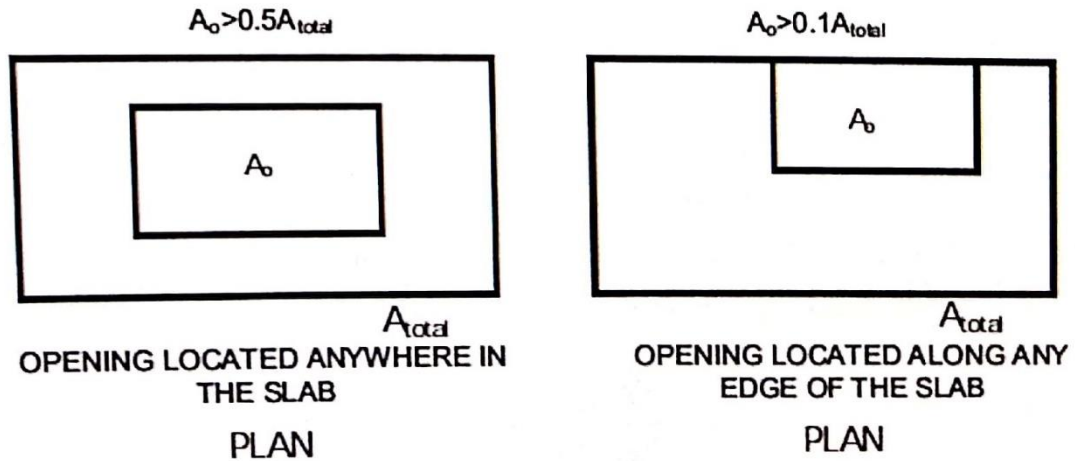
Floor slabs having excessive cut-out and openings (From IS 1893:2016)
